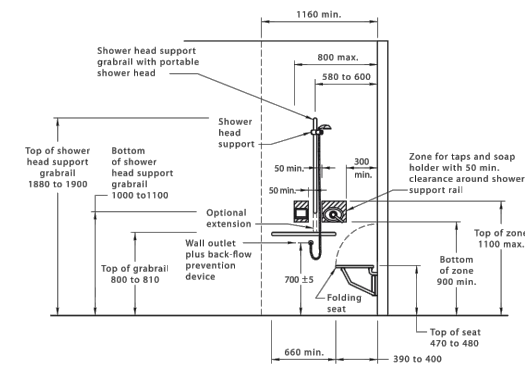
SHOWER RECESS FITTINGS—ELEVATION
